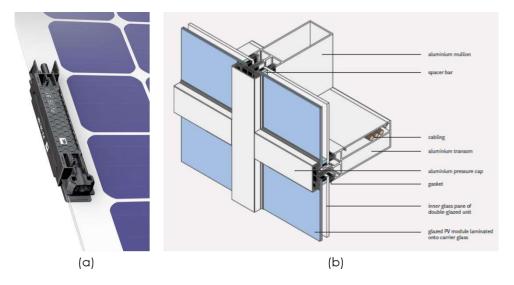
Electrical wiring for BIPV applications: (a) Side–connected junction box and (b) Cabling routed through the aluminium framing in a mullion – transom configuration.
